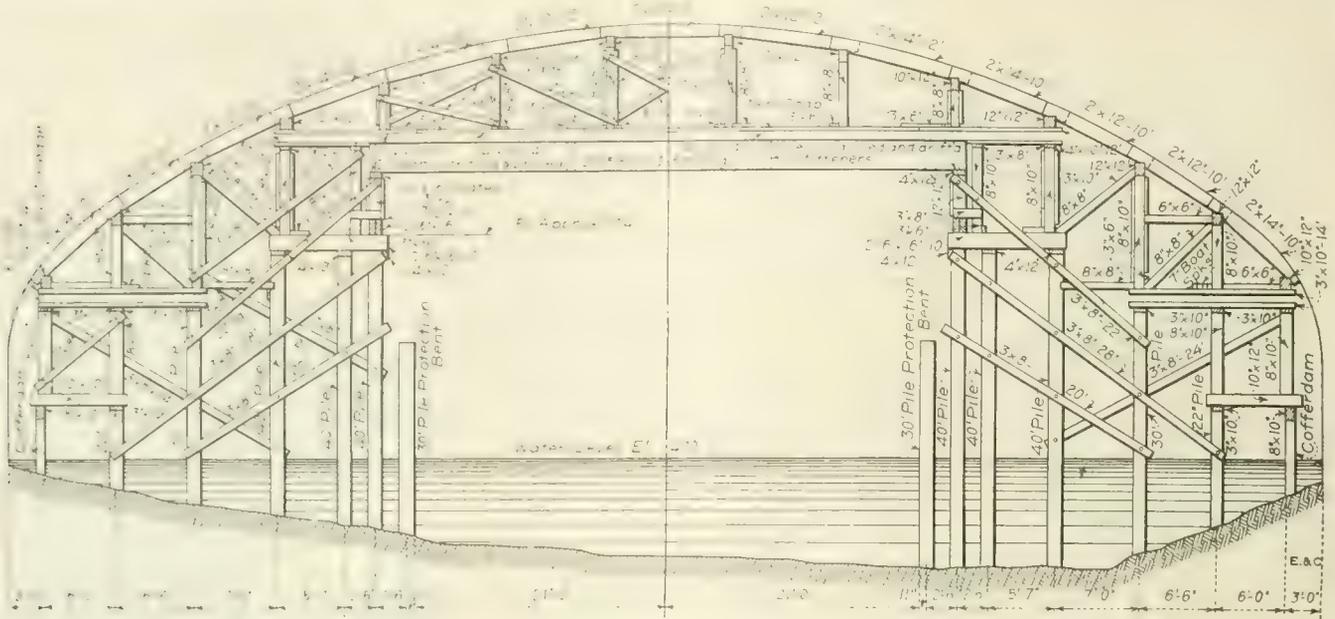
Details of Arch Centering and Supports for 110-ft. Span of San Jacinto St. Bridge. Note Size of Opening for Navigation.
